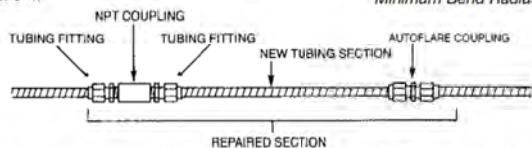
Repair of Damaged Tubing with a New Section of Tubing and a joint splice or a TracPipe® CounterStrike® AutoFlare® or AutoSnap® Coupling
